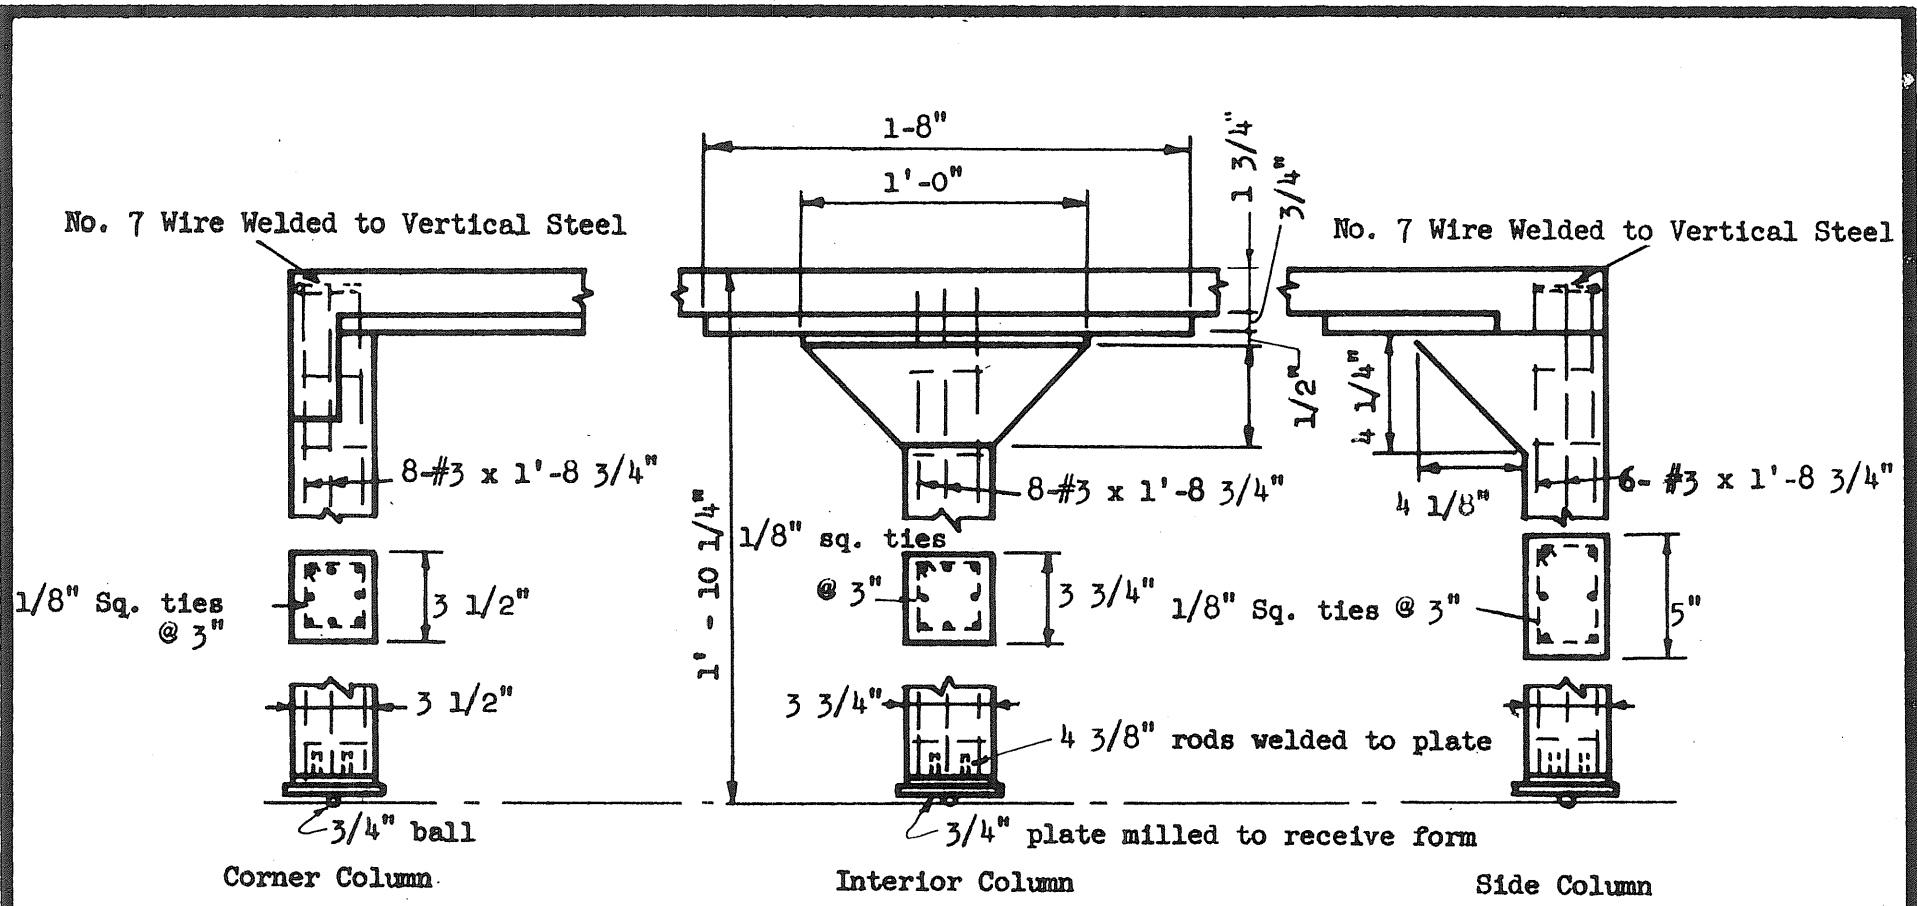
ARRANGEMENT OF COLUMN REINFORCEMENT
